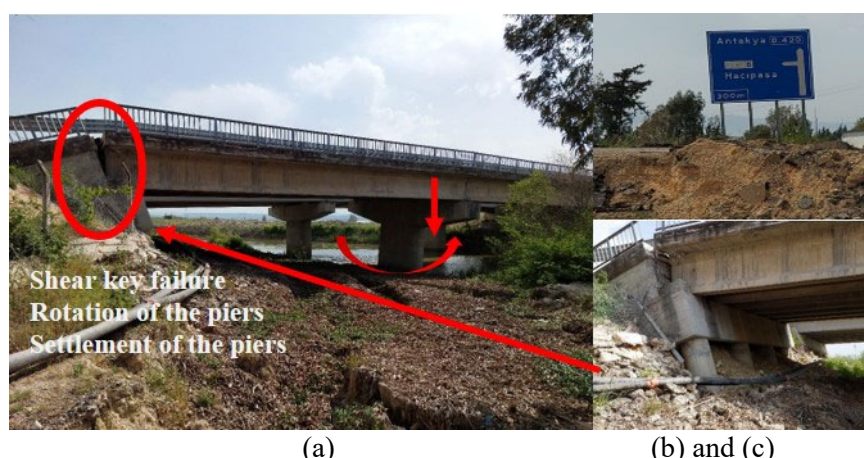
Damages in the bridge Demirköprü, Antakya; (a) Shows shear key failure, rotation of the piers, and settlement of the piers (b) another angle of shear key failure (c) location of the damaged bridge
